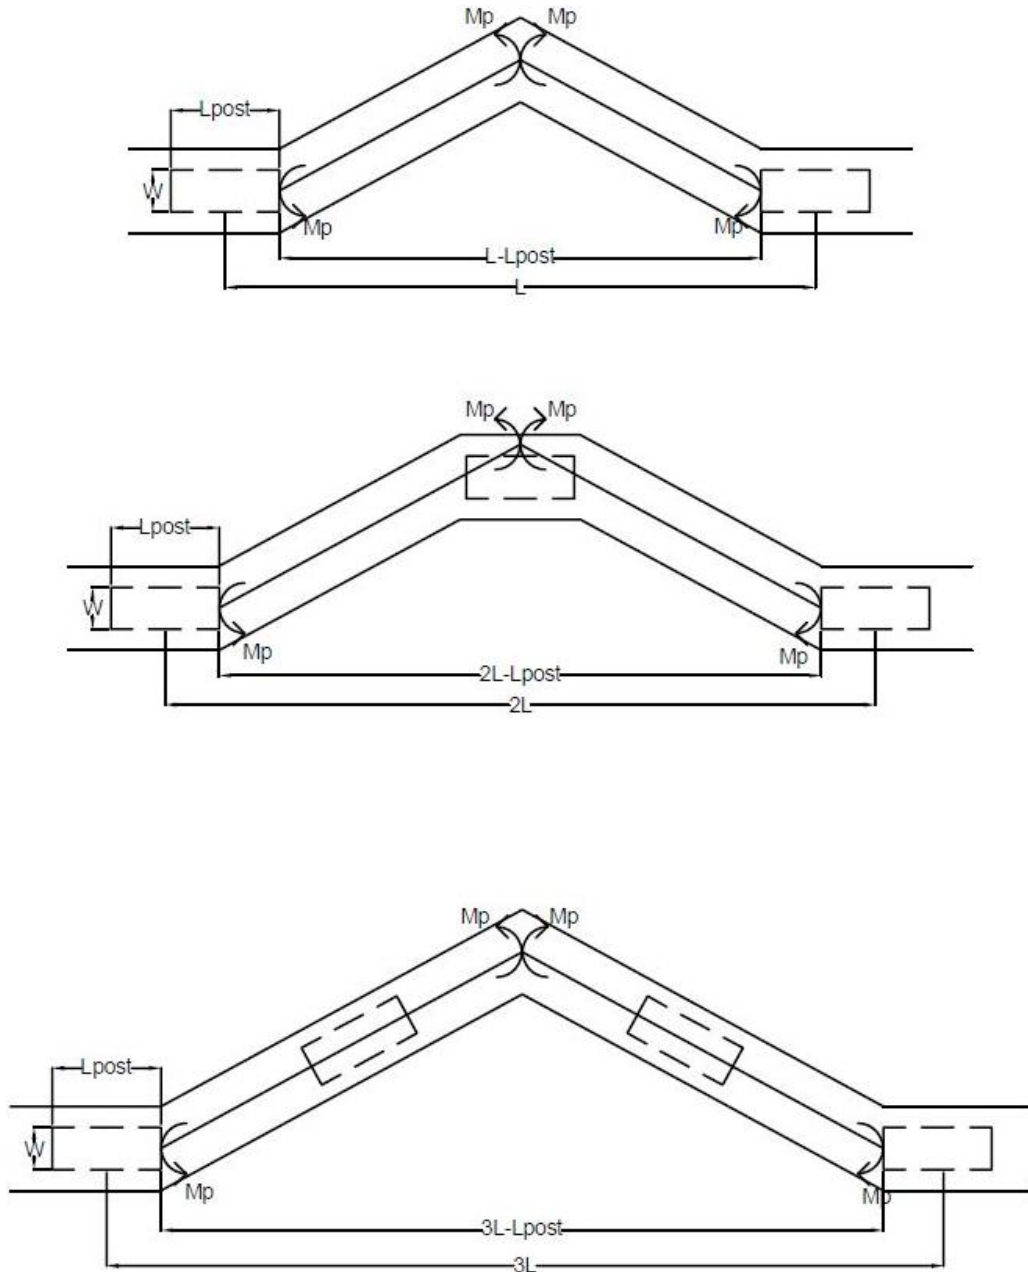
Modified AASHTO Post and Beam Method Failure Mechanism for Bridge Rail Interior Sections (Example of Two-Span Failure)
